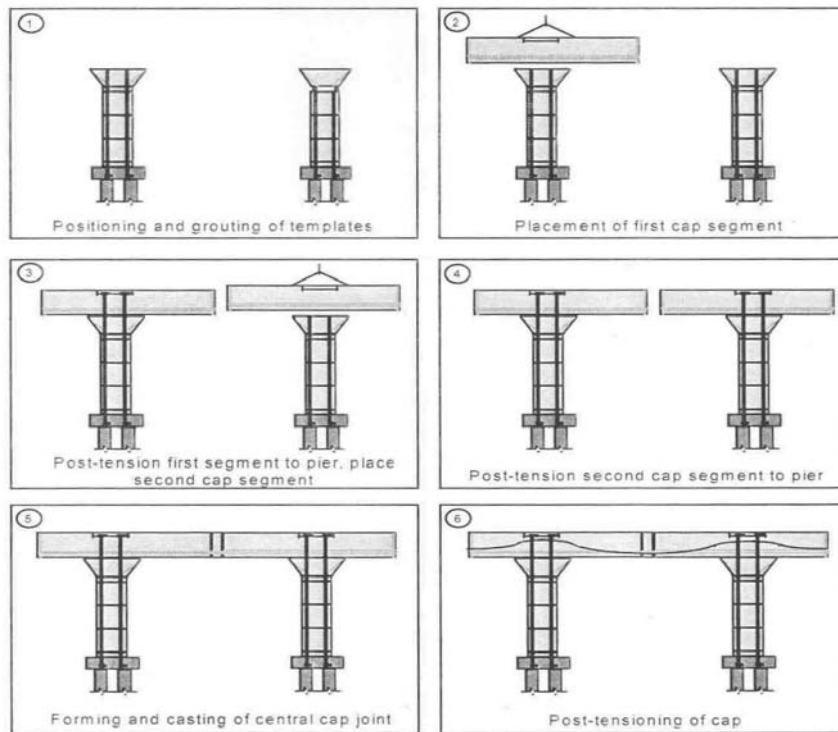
Erection sequence for a multi-column pier (Billington et al. 1999)
